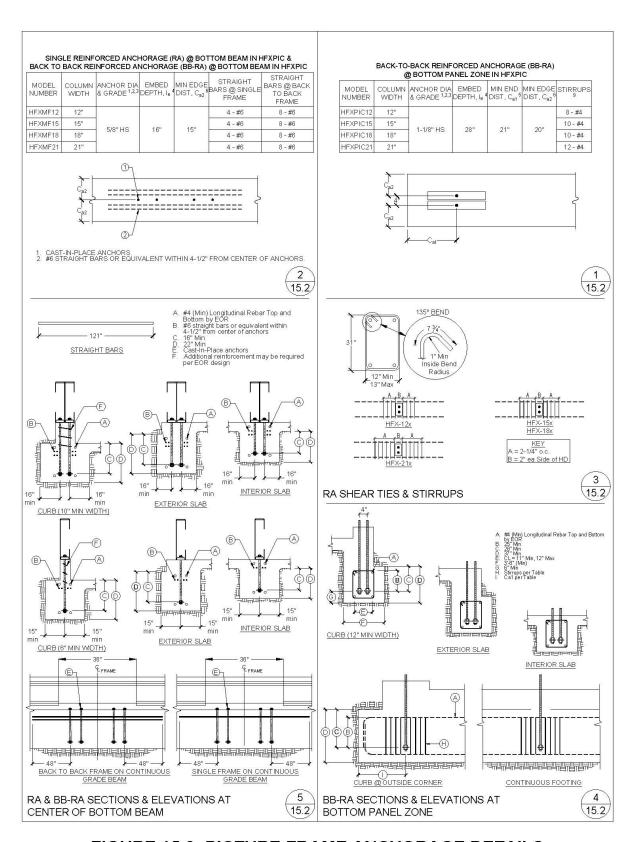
PICTURE FRAME ANCHORAGE DETAILS
